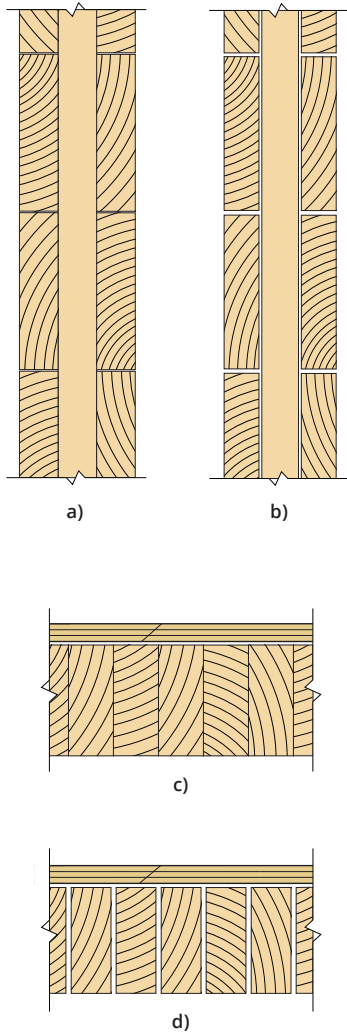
Example of cross-sectional changes of a CLT wall panel when a) laminations expand due to swelling, and b) laminations return to a lower moisture content. Example of the cross-sectional changes of an NLT floor or roof panel when c) laminations expand due to swelling, and d) laminations return to a lower moisture content.
